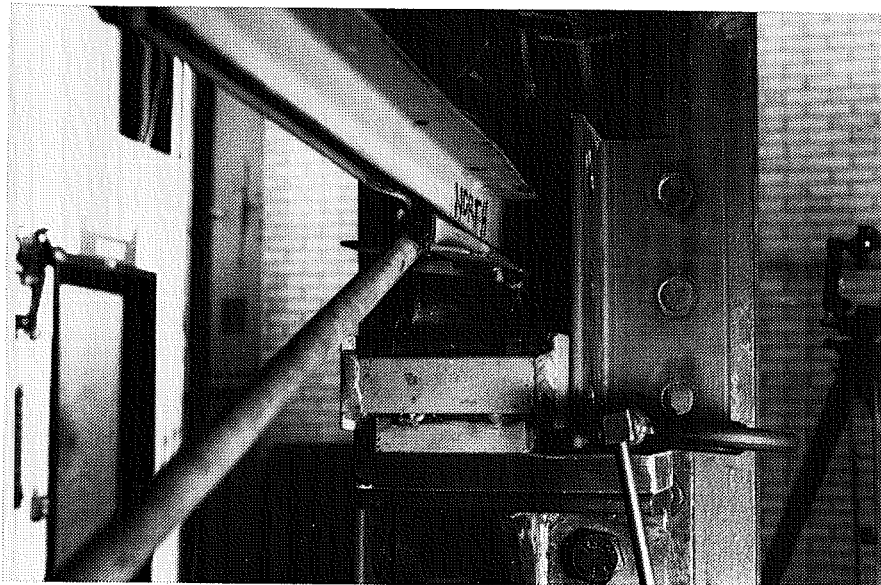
North End of Joist No. 2 Prior to Testing
